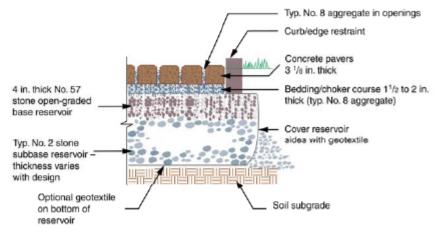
Typical Permeable Interlocking Concrete Pavement Note: ASTM No. 3 or 4 stone may be substituted for No. 2 stone. Note: ASTM No. 89 or 9 stone may be used in the paver openings. (Source: Interlocking Concrete Pavement Institute)
